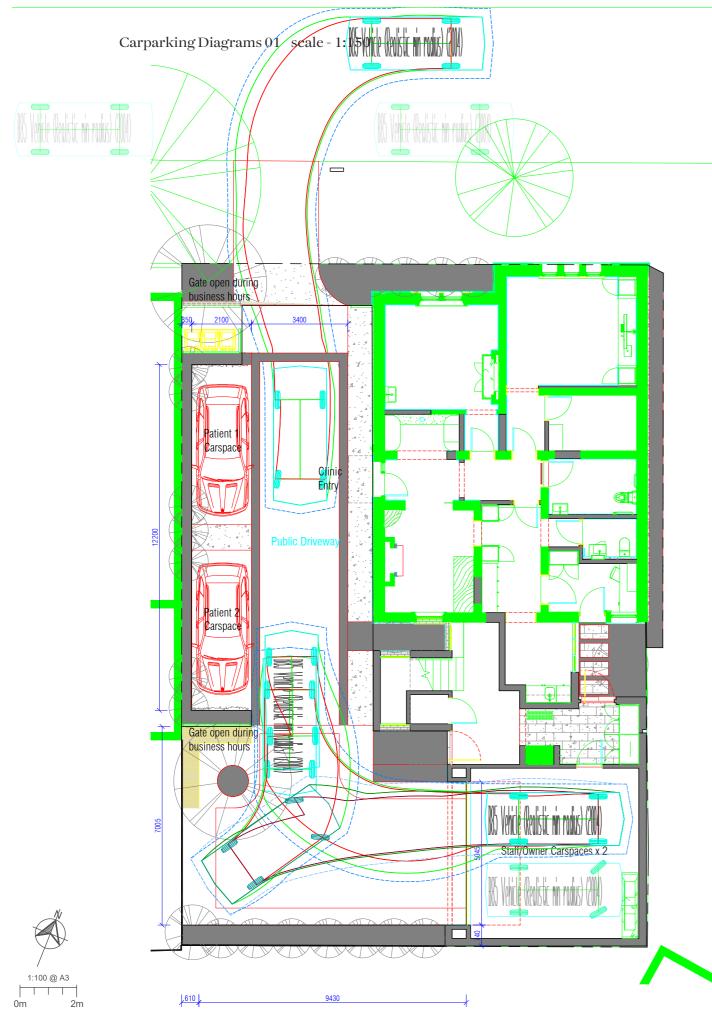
FIGURE A - Site entry and northern garage space accessibility 1201Rundle Street, Kent Town - File: 23-232 - 19/09/23
